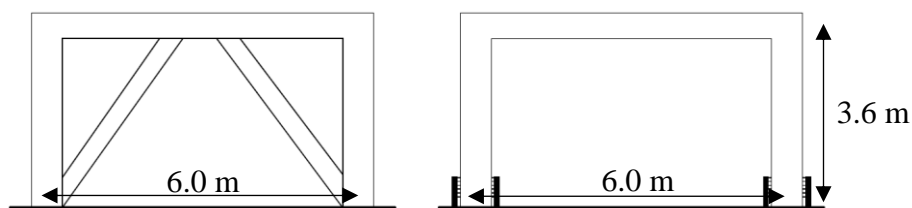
The case study building (left) EBF system (right) rocking RC frame;
